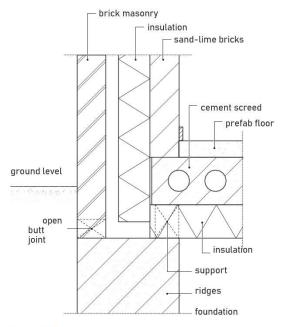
Continuing insulation layer in wall-floor foundation (detail)
